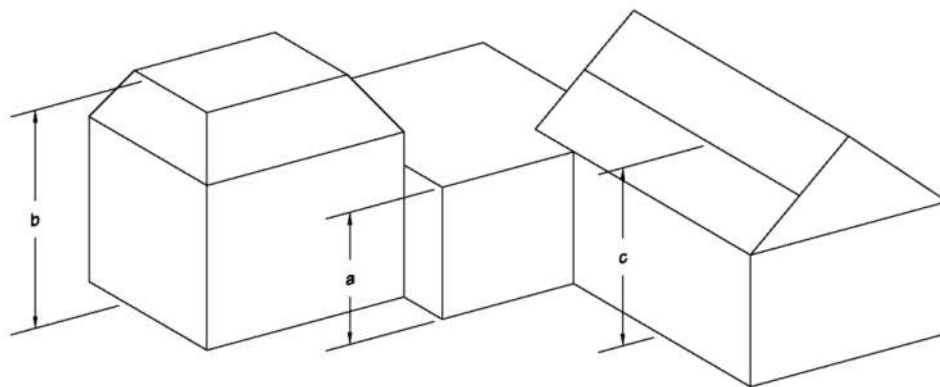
Building Height – height (a) indicates measurement for flat or shanty roof; height (b) indicates measurement for a mansard roof; and height (c) indicates measurement for a gable or hipped roof at the mean level between ridge and eave. Overall height for the structure is determined based on the highest of the various measurements (in this case height (b)).
